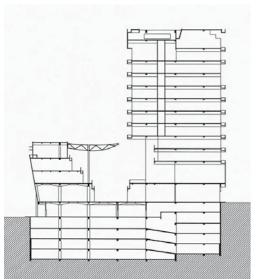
San Ignacio Shopping center section. Source: http://hanniagomez.blogspot.com/2016/04/
